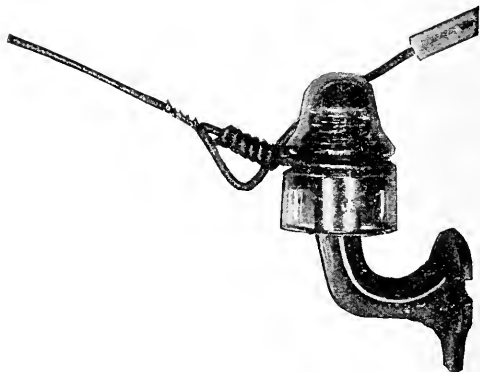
Dead ending a wire on a glass insulator and iron bracket—showing drip loop and inclined porcelain tube.
